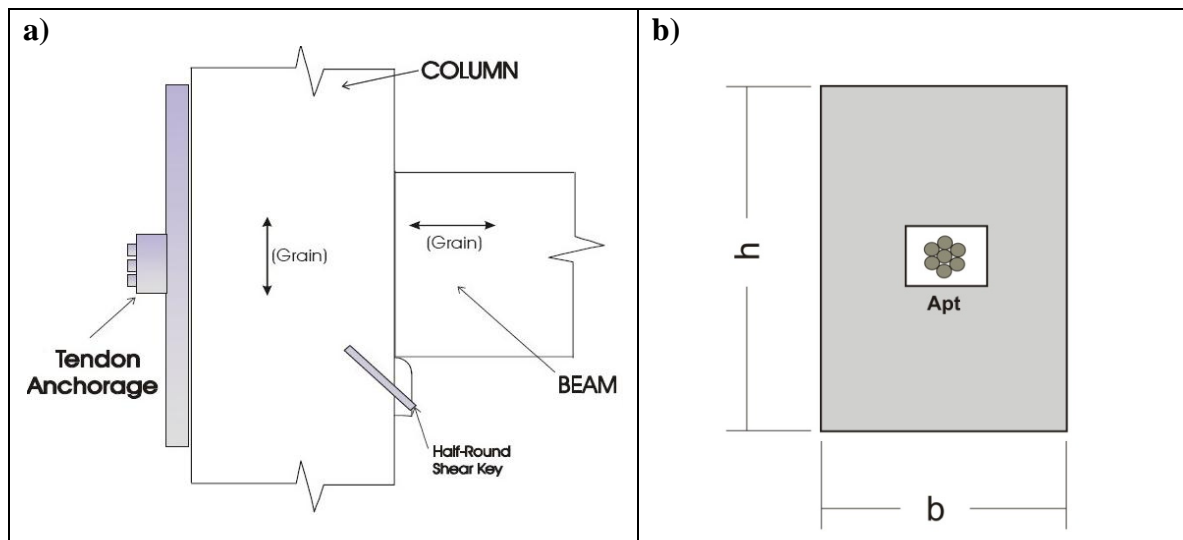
a) Beam-column configuration (Courtesy of M. Newcombe) b) Beam cross section
